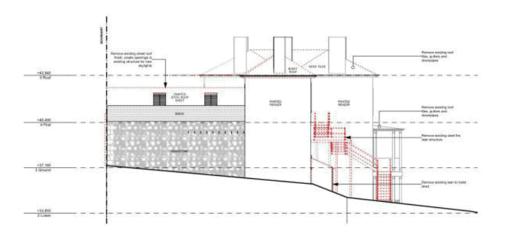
Existing north elevation (facing into the site), showing the three-storey main dwelling on the right-hand side, and the two storey servant's wing on the left-hand side.
